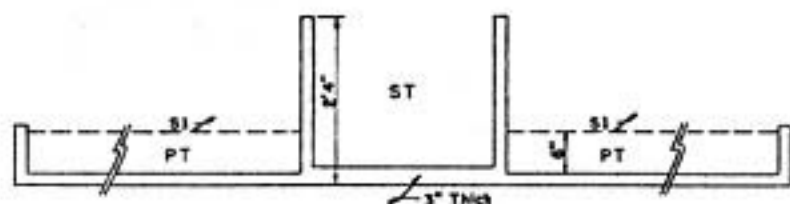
This shows a lengthwise section of the unit, through the middle. Each growing-unit (P.T.) is 25 feet long, with the end walls and side walls (not shown) eight inches high inside and 10 inches high outside. The solution tank (S.T.) is 34 inches long, running with the bottom of the whole unit, and 28 inches high, outside dimensions. The width is considered as running crosswise with the growing-unit, which is four feet, outside dimensions. (S.L.), sand level.
